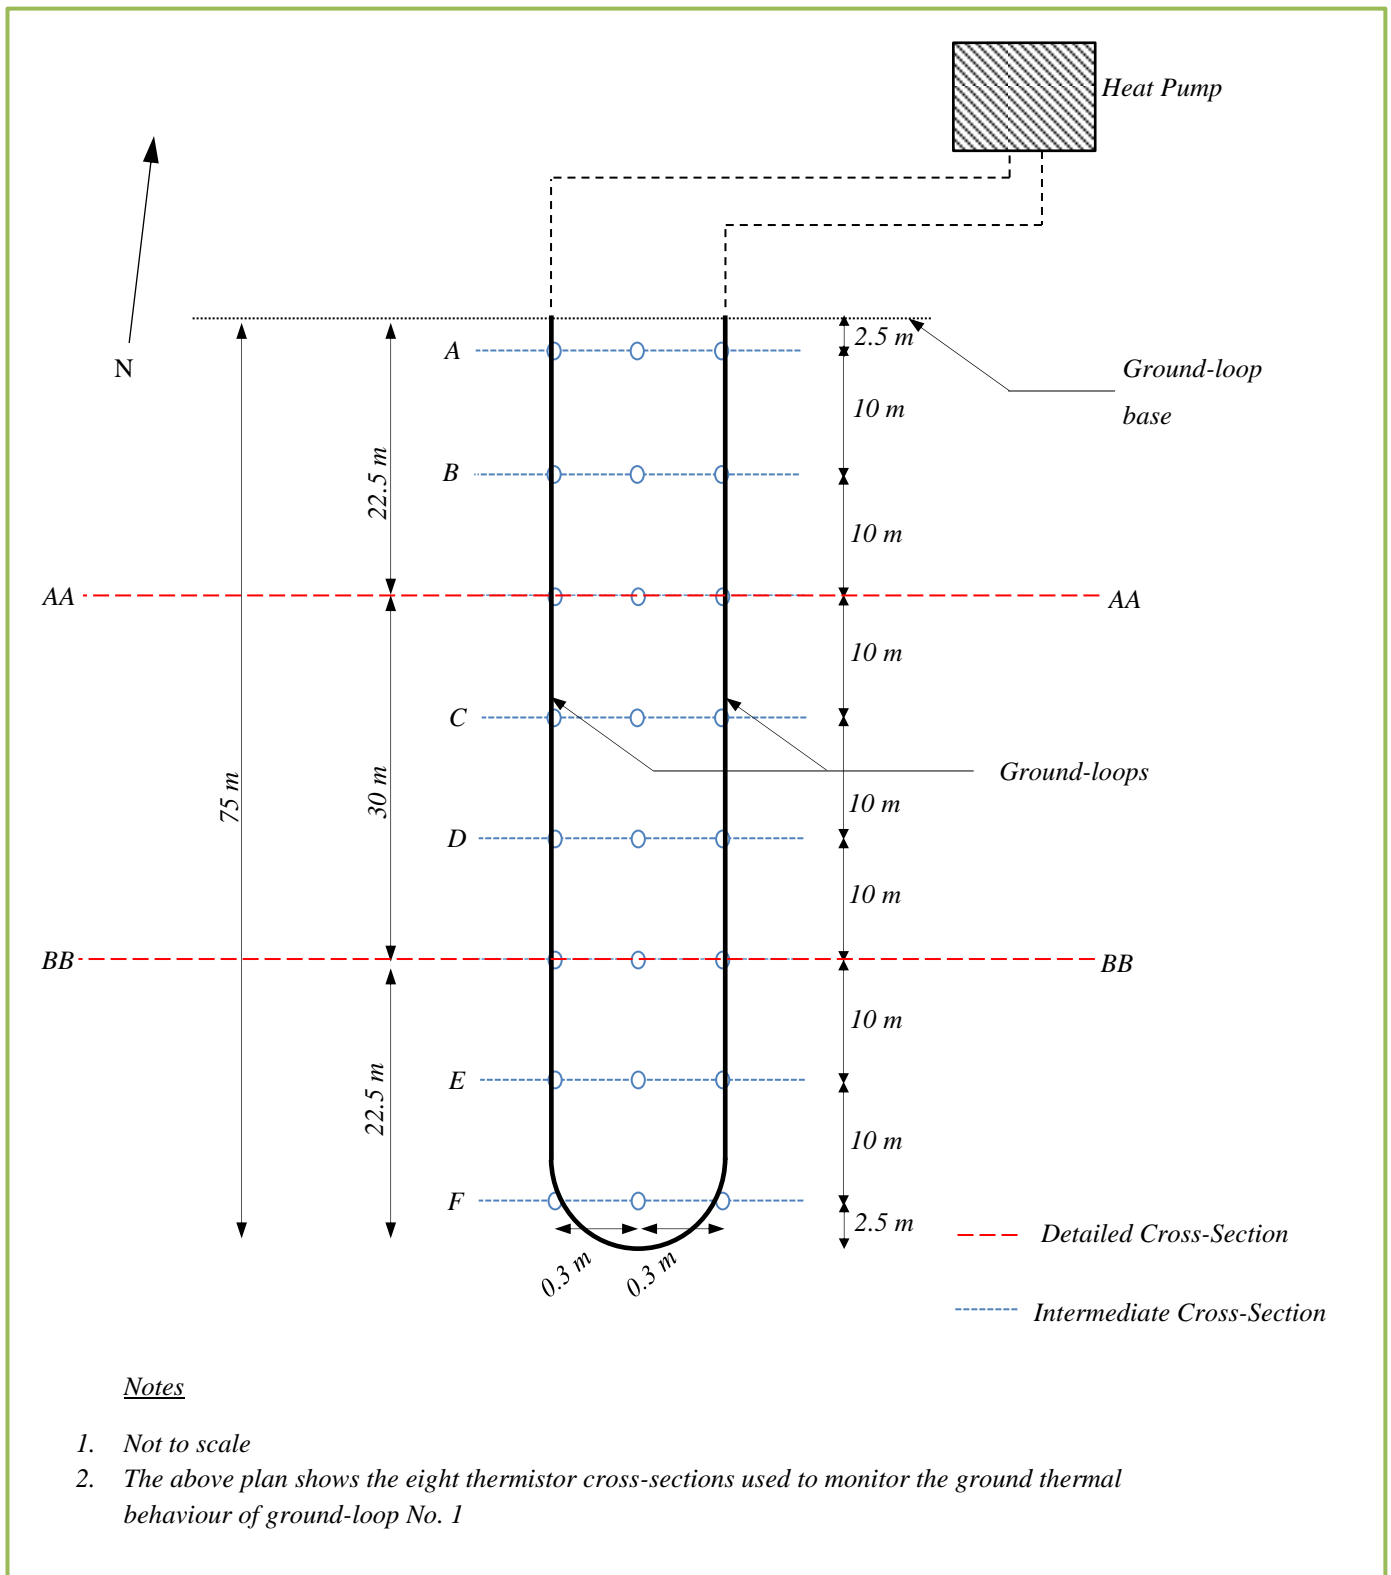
Plan view of the thermistor layout showing the position of the ‘intermediate’ and ‘detailed’ cross-sections.
